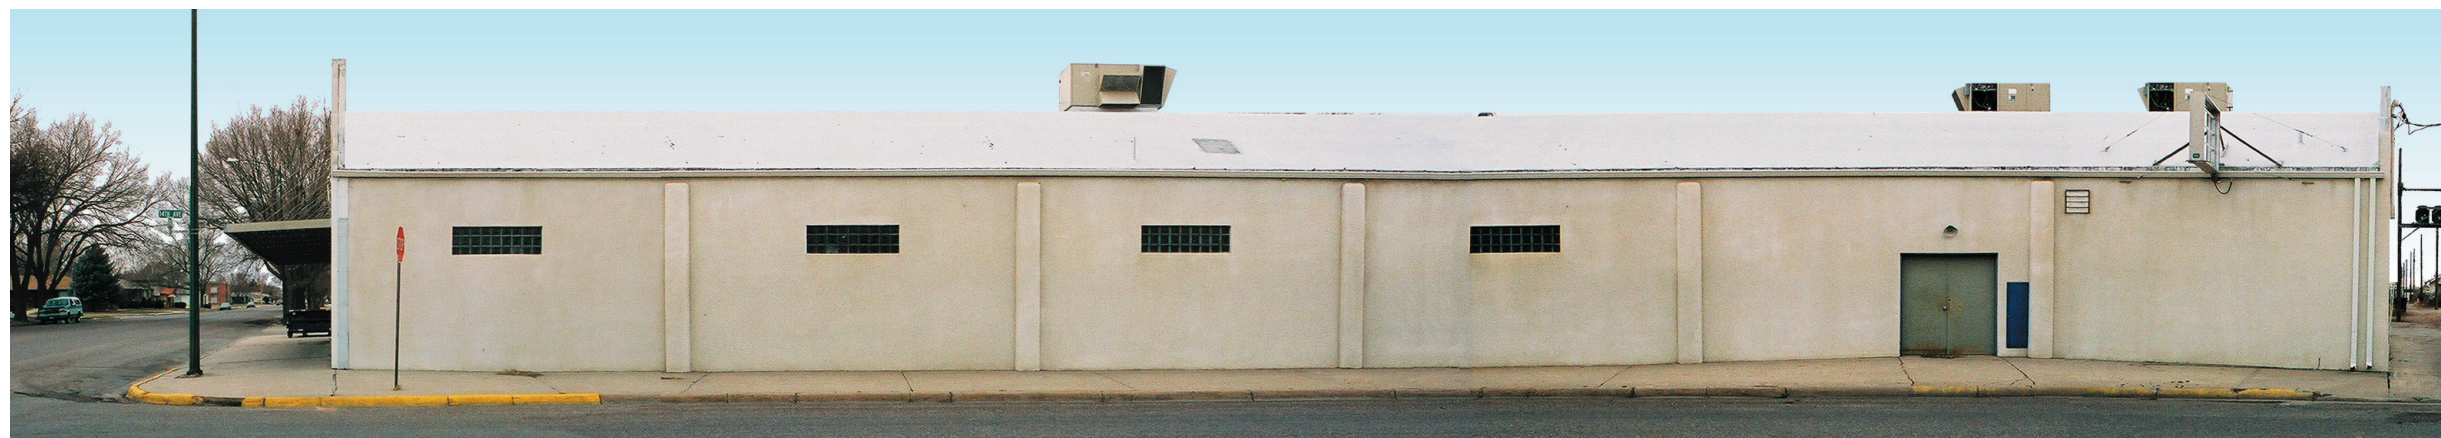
Existing Condition (East Facade): A new window, door and sidelight are to be added to the southernmost bays. An overhead door is to replace the existing double doors and a new steel door will accompany it.
